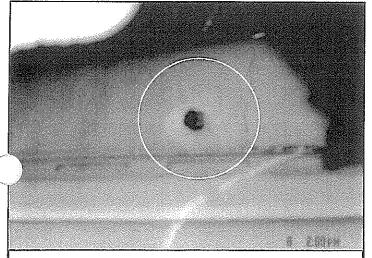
Facing west. Picture shows large gap between level at plumb and out of plumb column.
